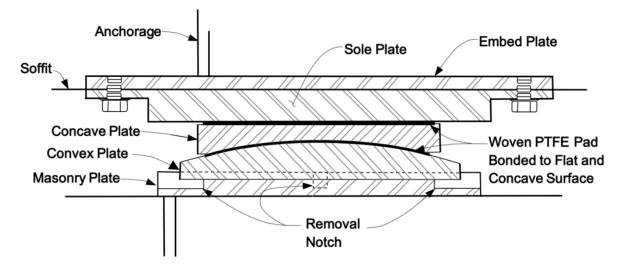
Example of Multidirectional Sliding PTFE Spherical Bearing with Replaceable Sliding Surfaces
